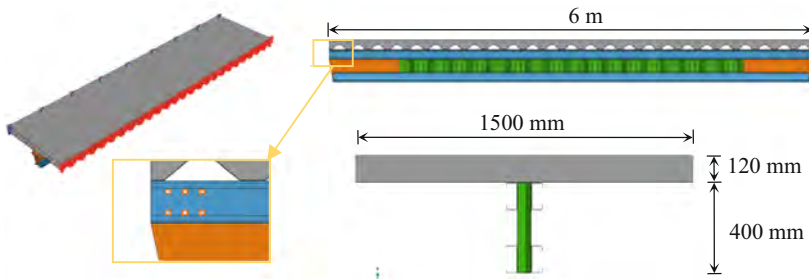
Geometry and boundary conditions of LWT-FLOOR composite beam.
